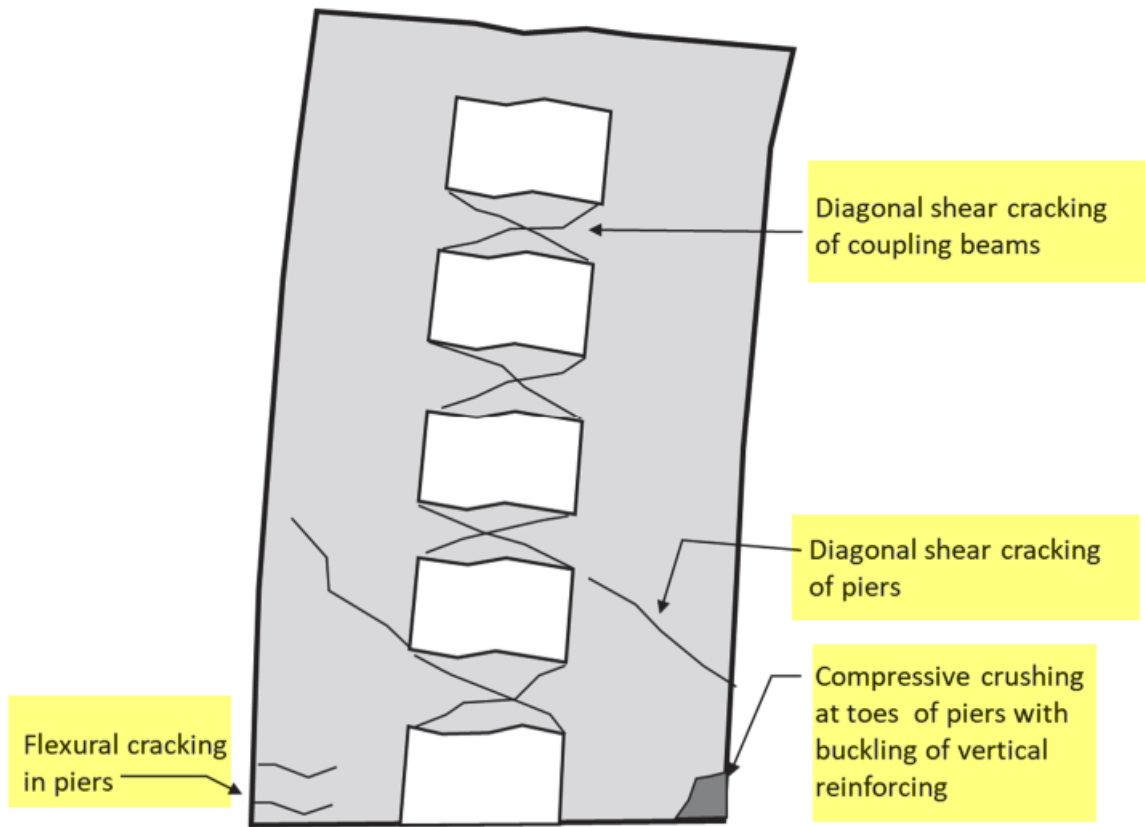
Deformed shape and typical damage patterns in multi-story concrete or masonry
